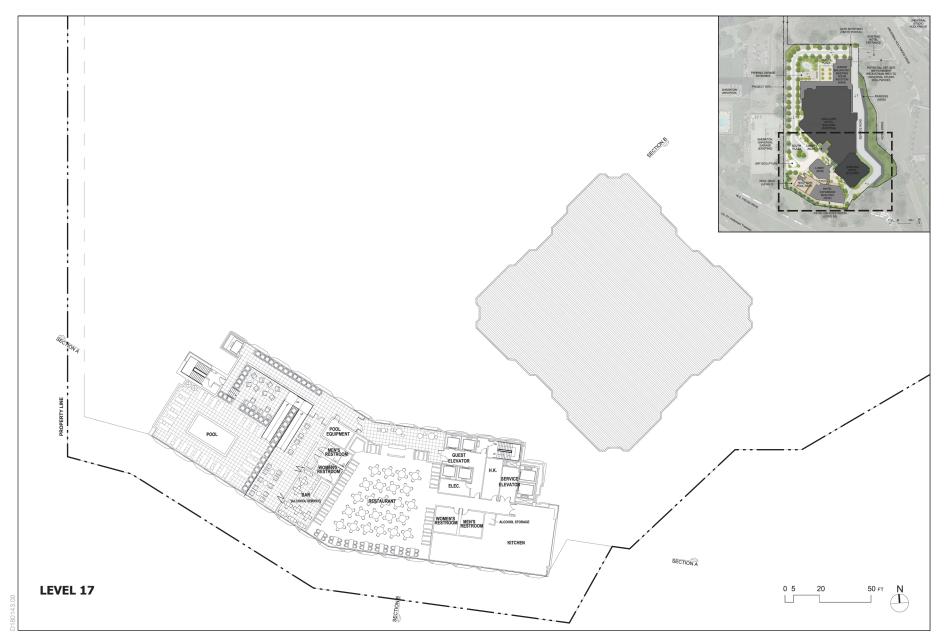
Level 17 (South) – Hotel Expansion Building
